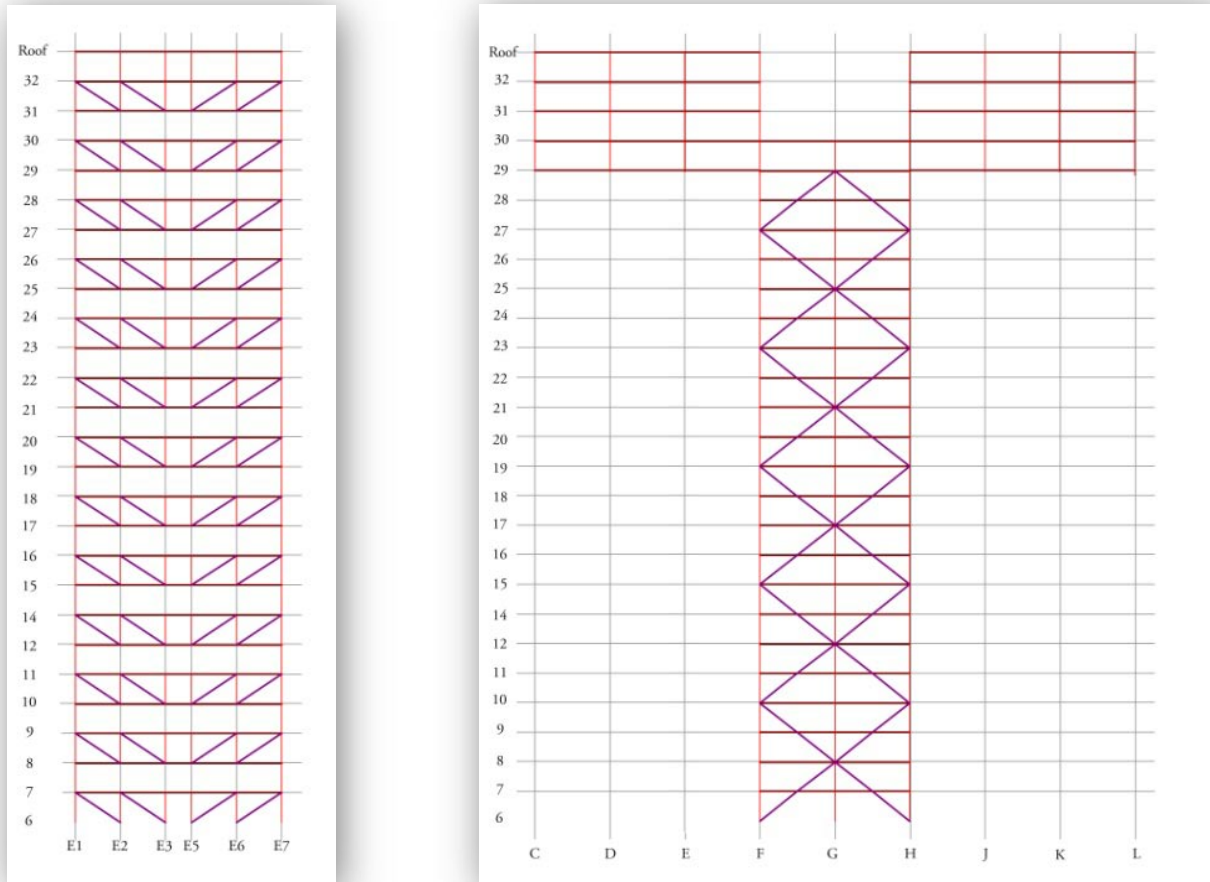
Section of Staggered Truss Frame (left); Section of X – brace frame (right)
